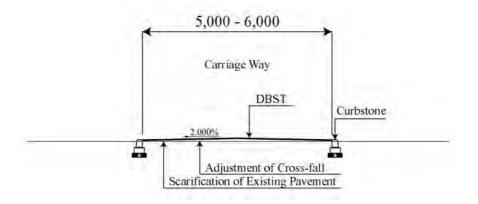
Standard Cross-Section: Jetty Road in Betio
